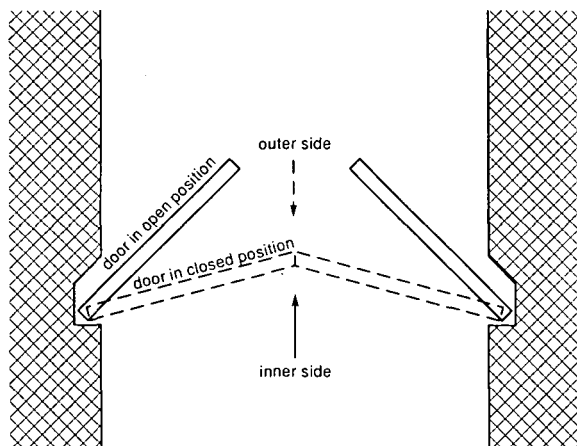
Plan view of an outlet sluice with vertical doors (Smedema and Rycroft 1983)
